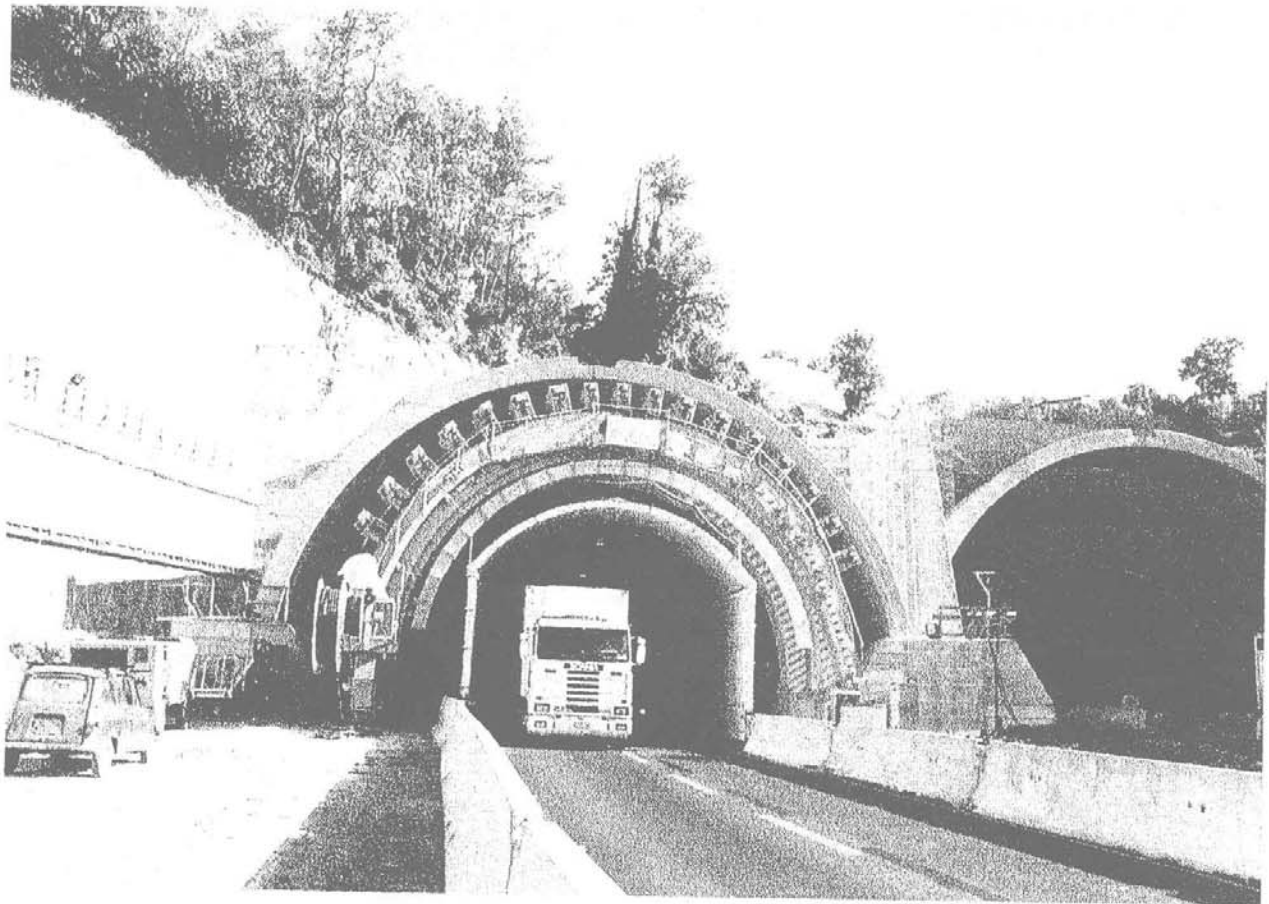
The multipurpose machine in a construction site on the Nazzano tunnel
